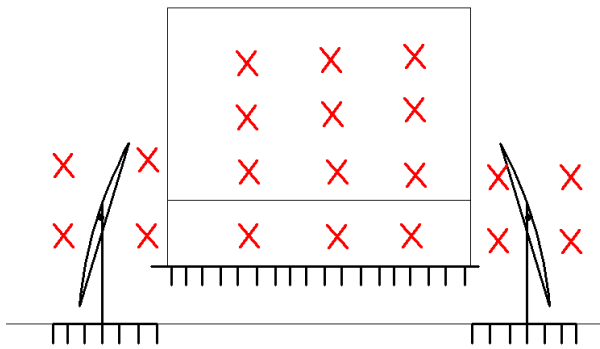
Front view to exhibit the support frames are parallel to the side walls.
